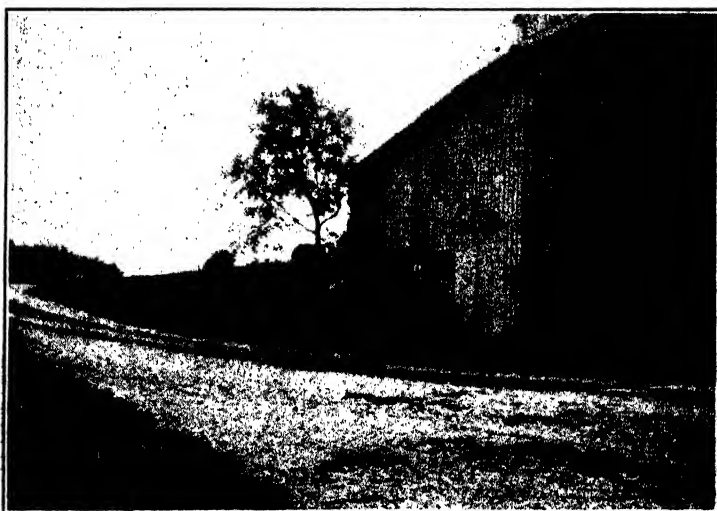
The barn approach is a convenient place for an underground vegetable storage
